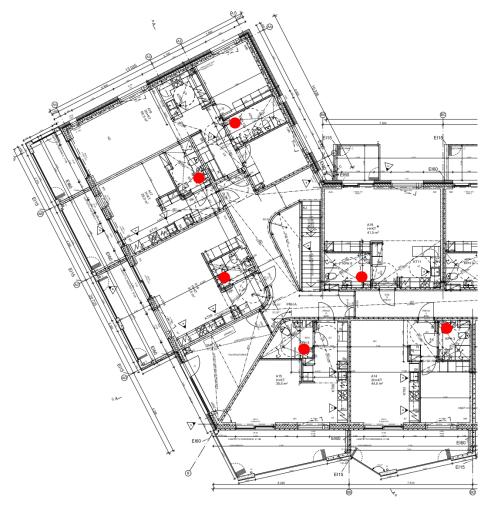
Sensor locations in the 2nd floor of section A. Other floors are installed similarly.
